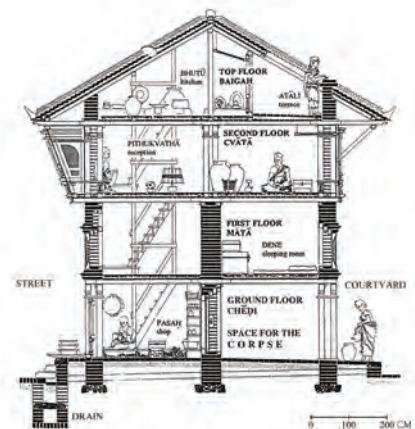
Section of traditional newar house (Quoted from "Architecture of Newars")
